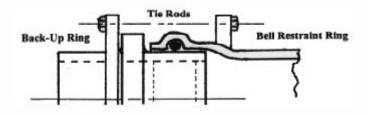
HDPE to PVC Slip-Joint Anchor Configurations
